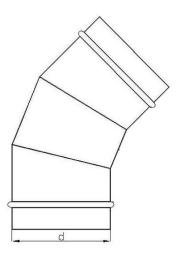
Segmented Elbow 60°, 45° Circular Section
